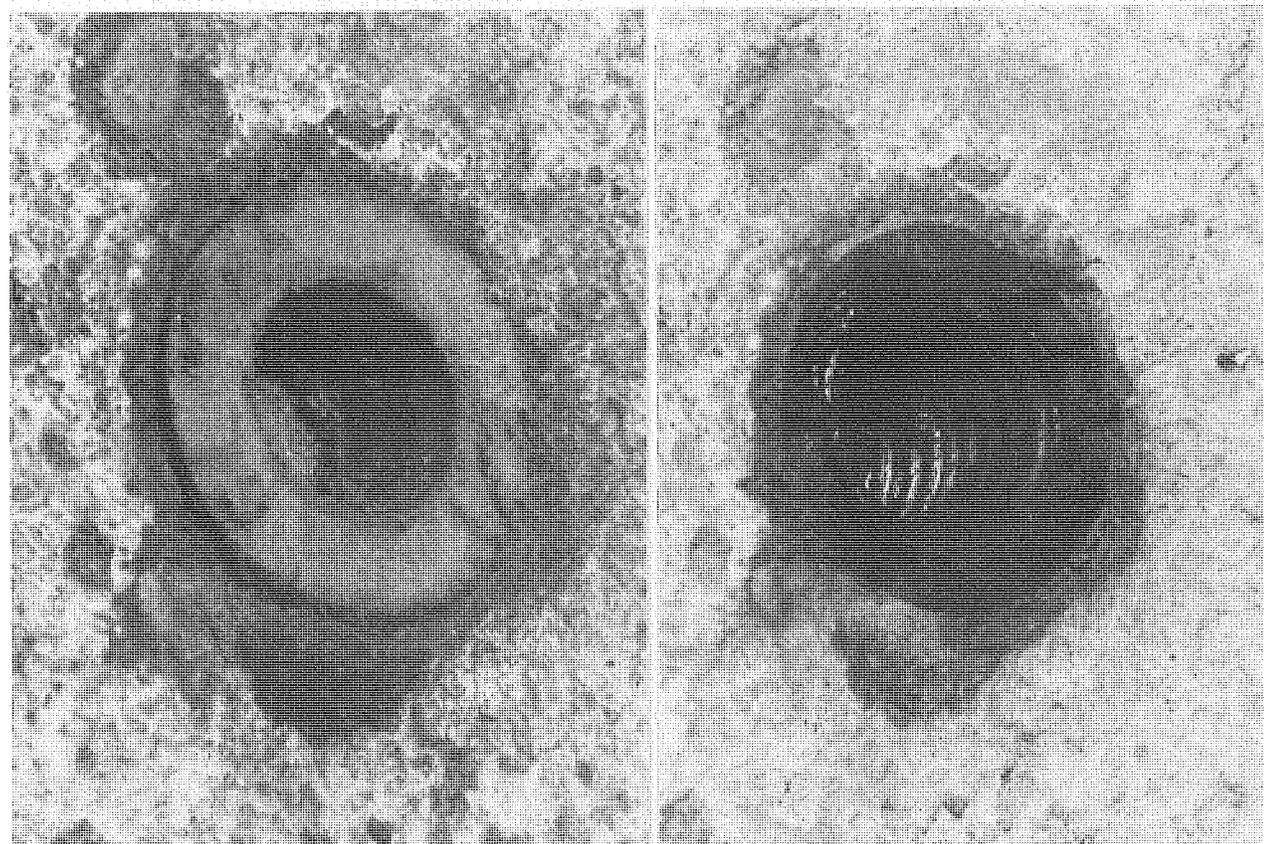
Typical condition of properly sealed coupling, showing sealing plug (top) and exposed threads (bottom).
